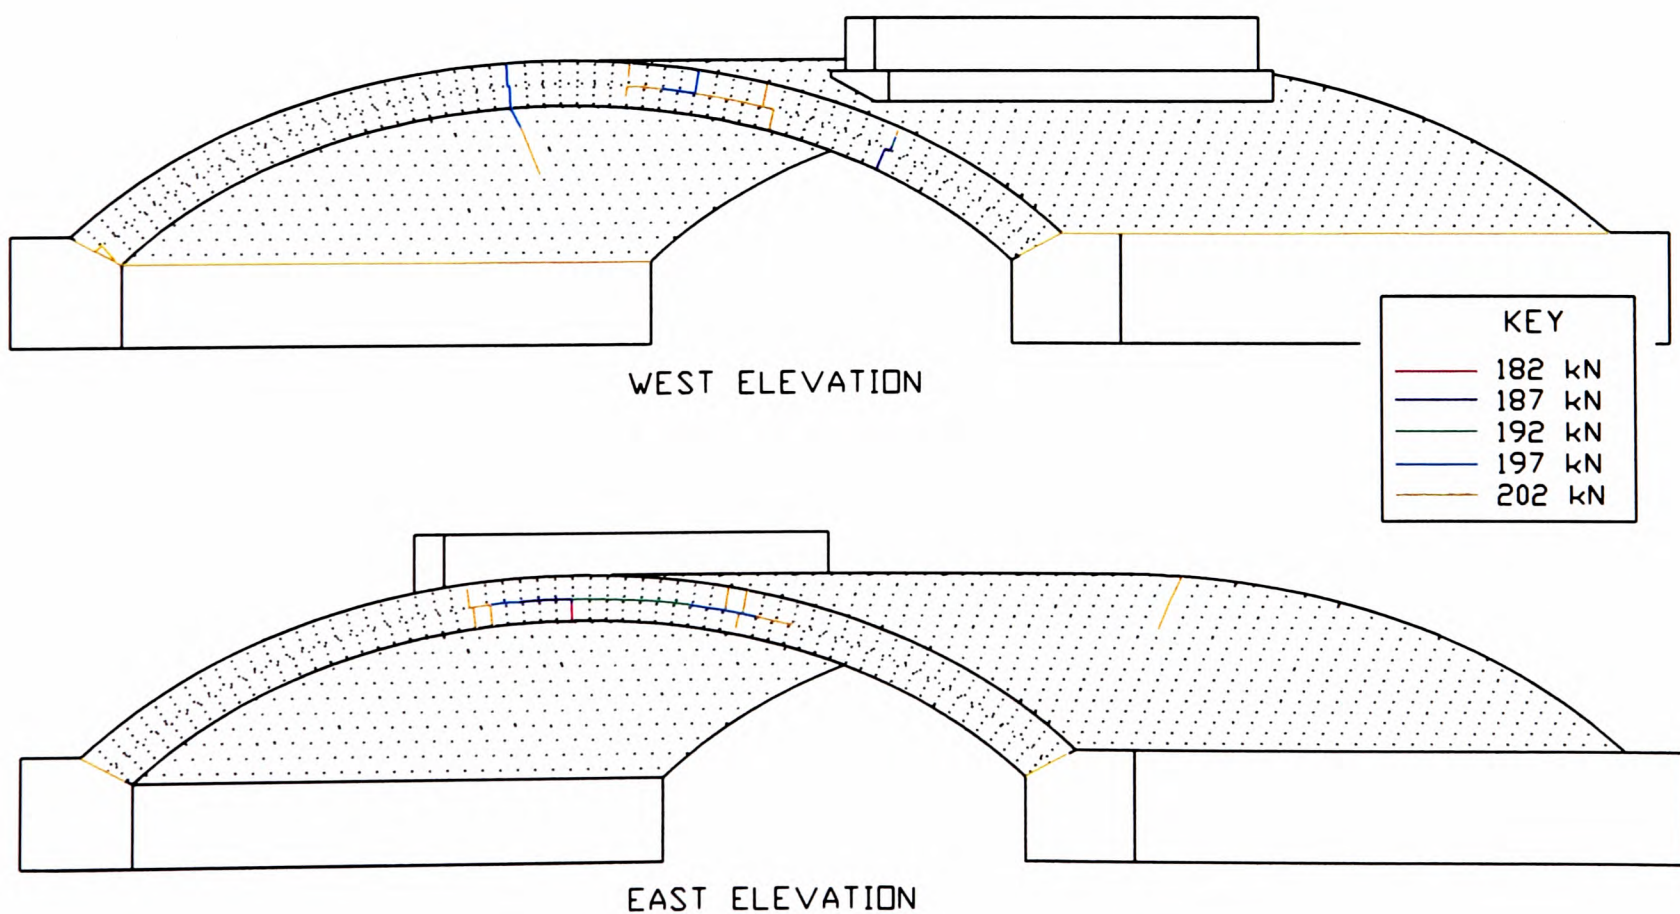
Development of cracks up to failure within skewed arch 3-2
